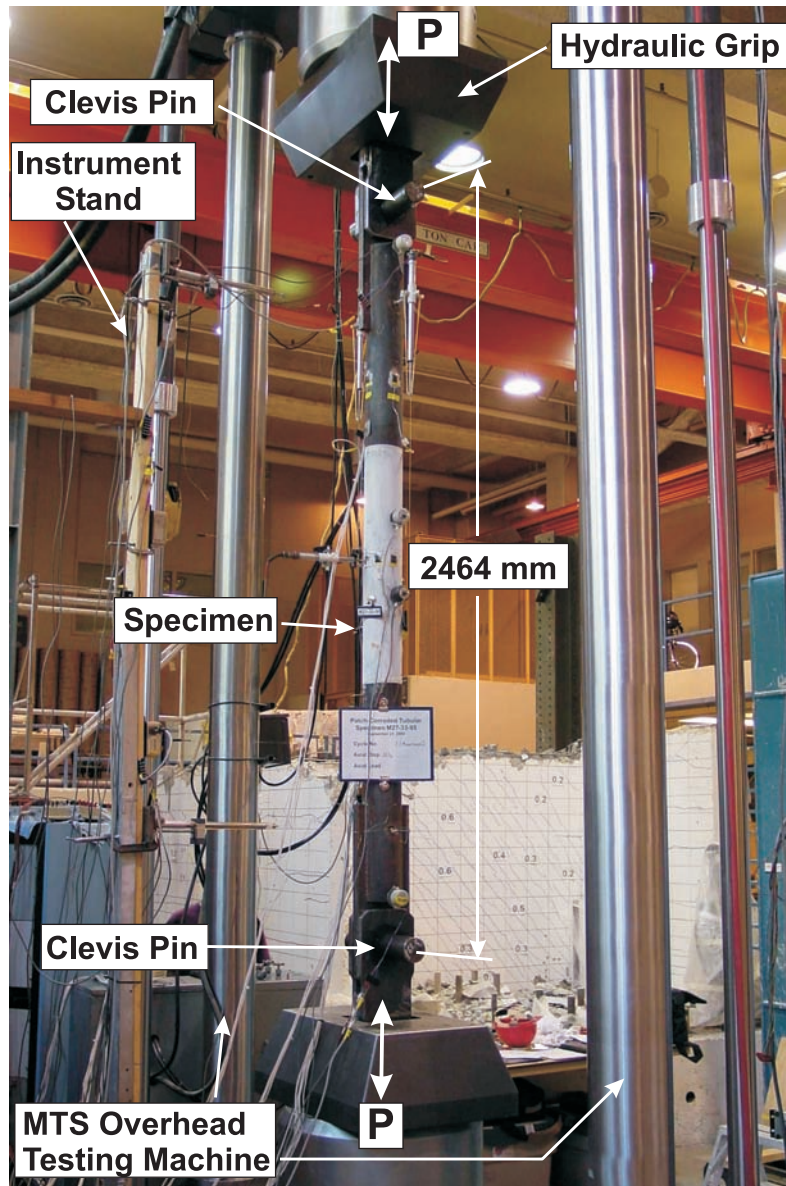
Overall Setup of Specimen in MTS Testing Machine
